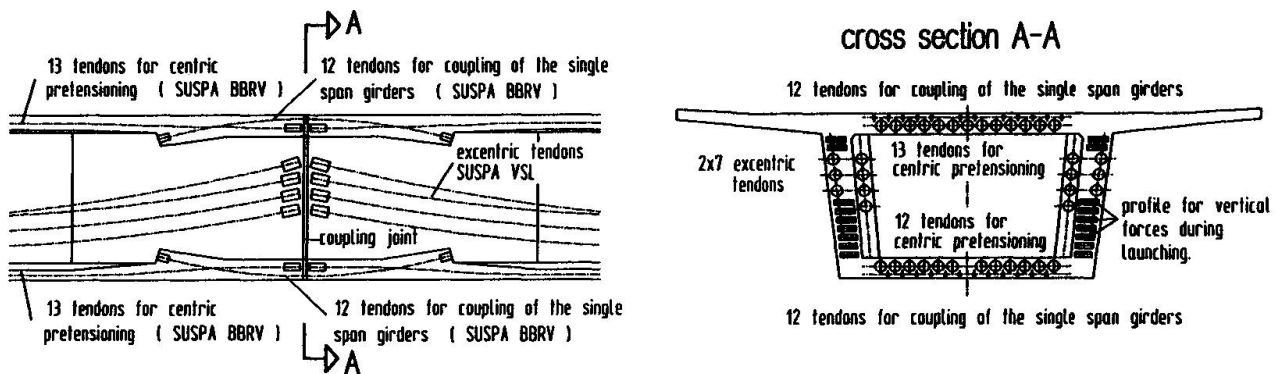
Coupling joint of the single span girders, longitudinal section and cross section
